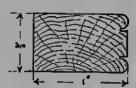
Part Horizontal Section of Wall-cupboard Bracket.
